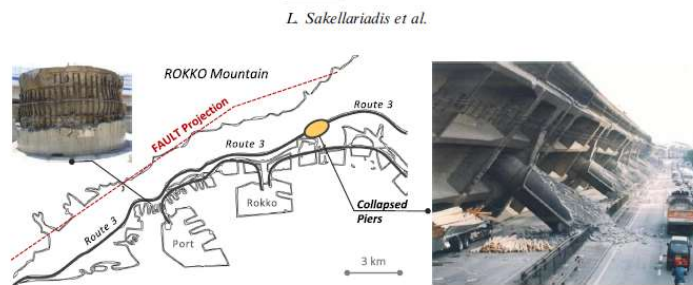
City of Kobe, showing the Hanshin expressway Route 3 extending almost parallel to the fault projection, and the location of the collapsed bridge piers at the area of Fukae; post-seismic photo of the collapsed bridge and exhibit of plastic hinging of one of the failed piers in the city seaside.
